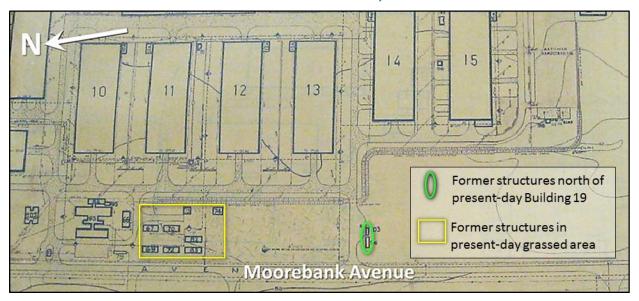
c. 1966 plan of Stage 1A area (2 B.O.D. Moorebank road resurfacing, National Archives NDL67/484/FOLDER 74).
